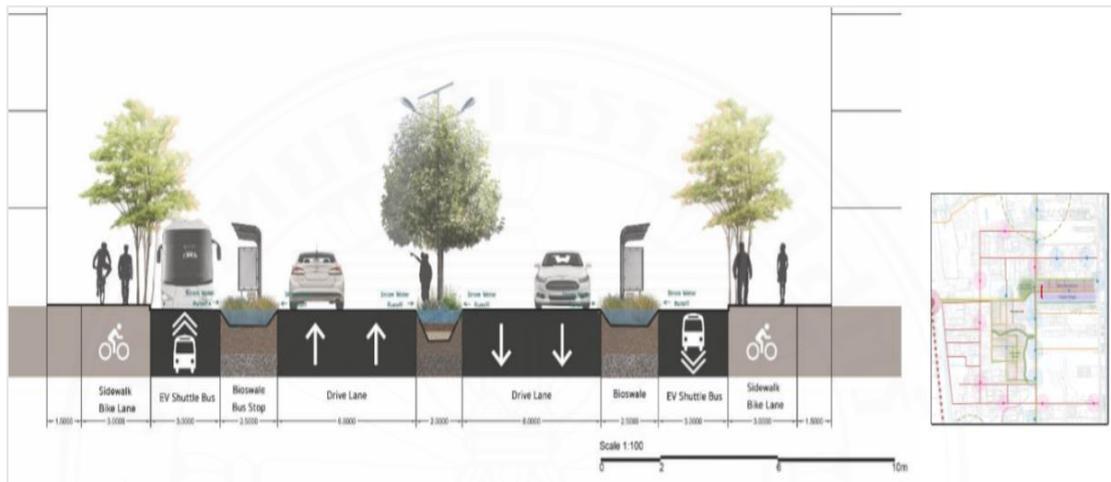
Section A-A': Share street in Nava Nakorn main road with bioswale for storm drainage
